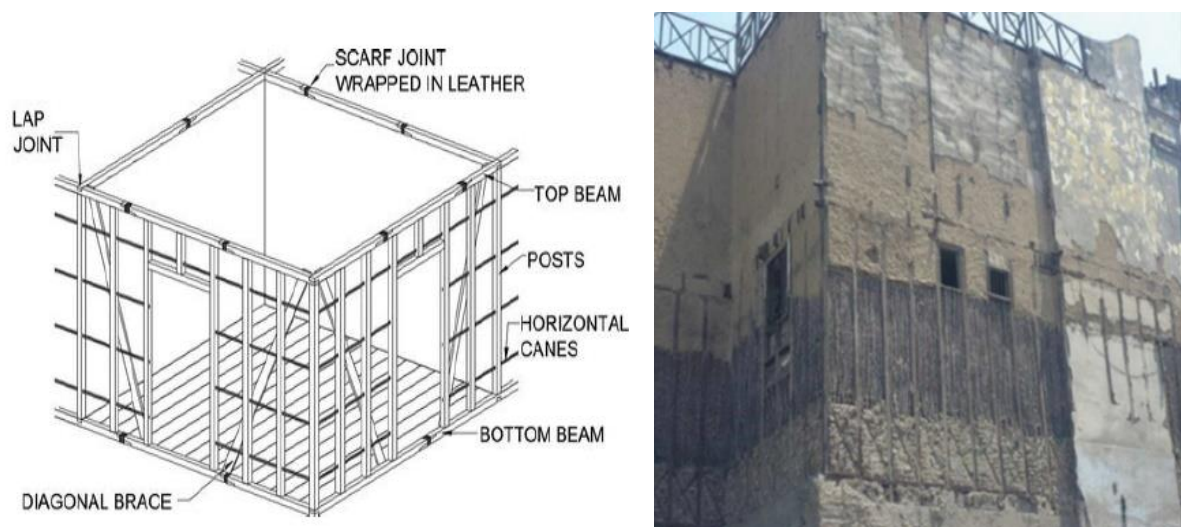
Quincha building: (a) Structure of a whole. (b) Example of a wall. (Quinn, 2017)
